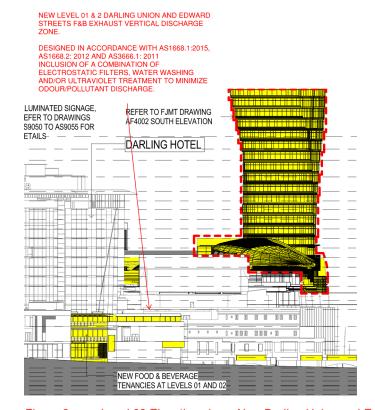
Level 03 Elevation view - New Darling Union and Edward Streets F&B exhaust discharge location.
